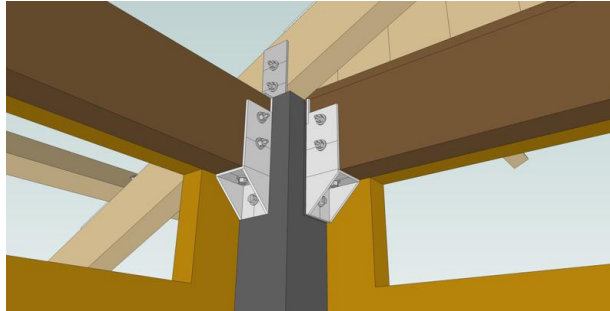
Roof Battens are Placed Accordingly to the Brackets Pre-Fixed on the Trusses
